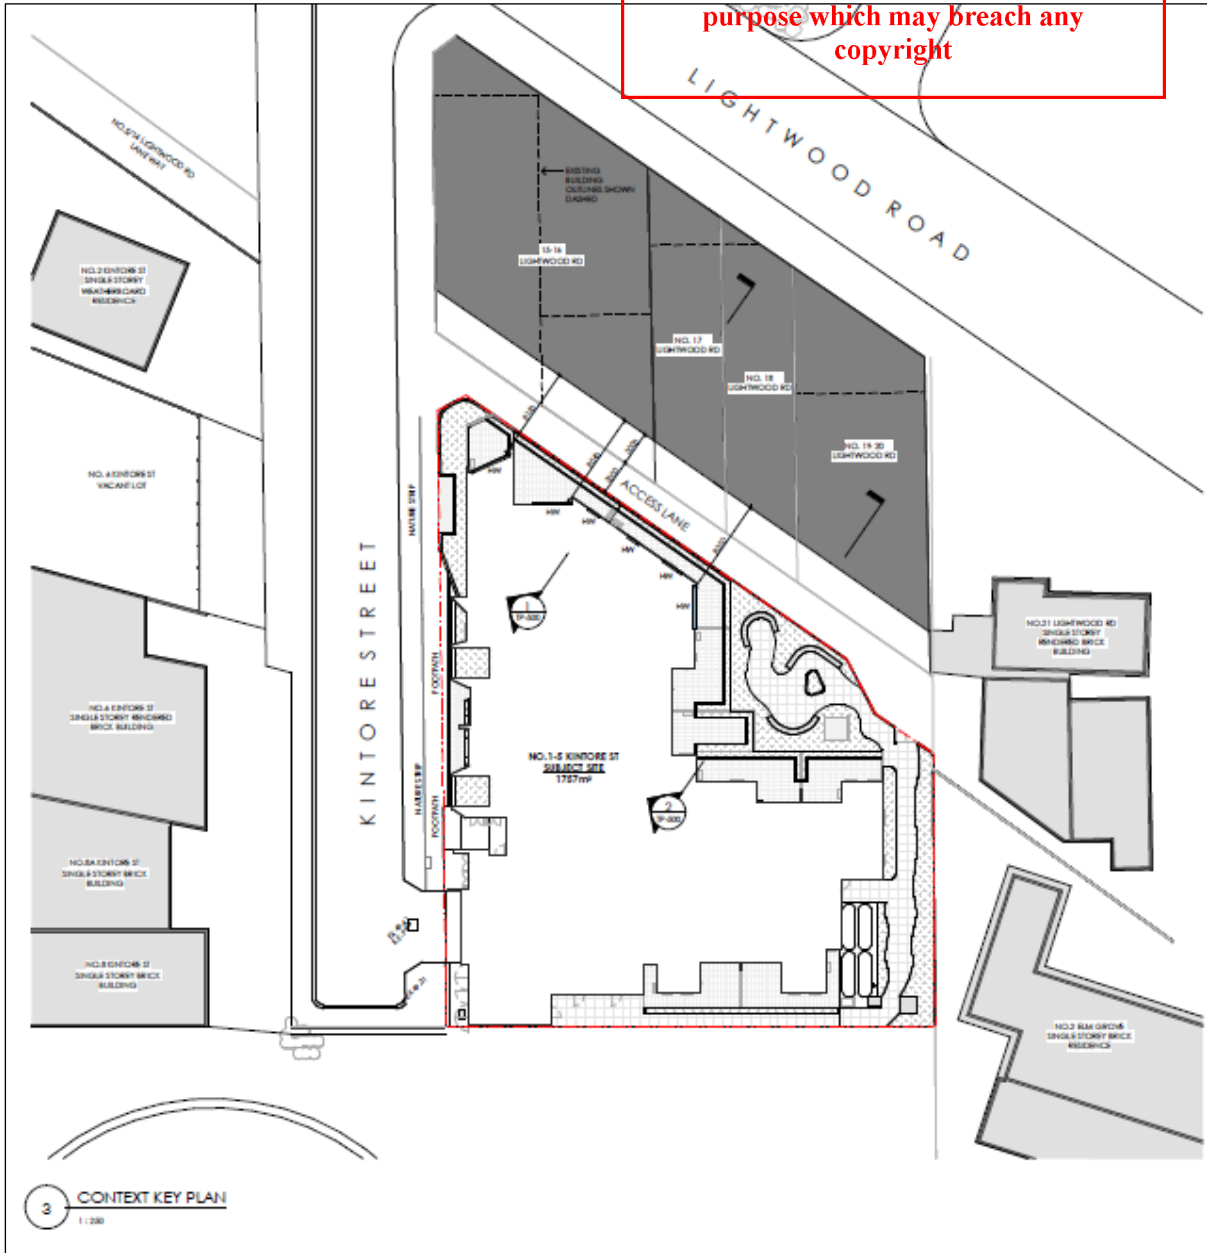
Context Key Plan highlighted north facing habitable room window setbacks
